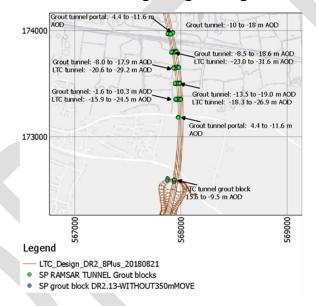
Grout tunnel and Lower Thames Crossing main tunnels alignment showing portals and grouting blocks.
